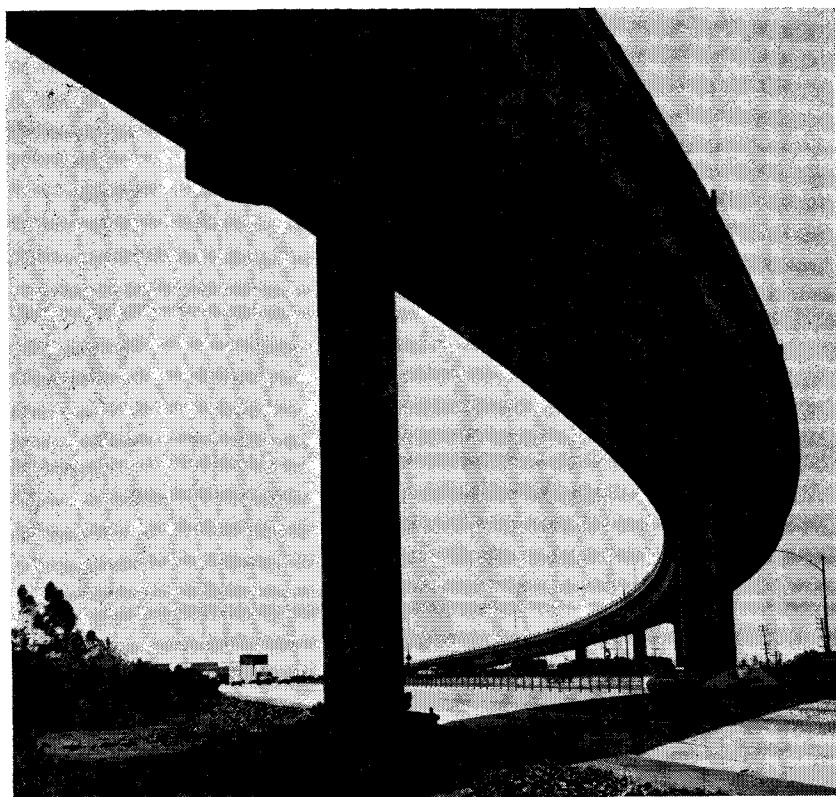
Southeast Connector Overcrossing. Prestressed unit with spans of 136, 193, 136 ft.
